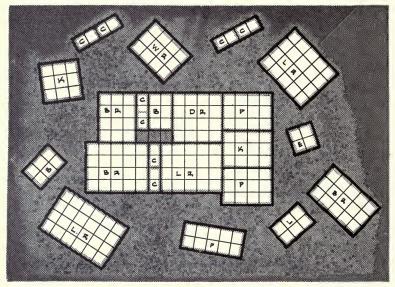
Cutouts made to the same scale as the floor plan are useful aids to help in planning.
